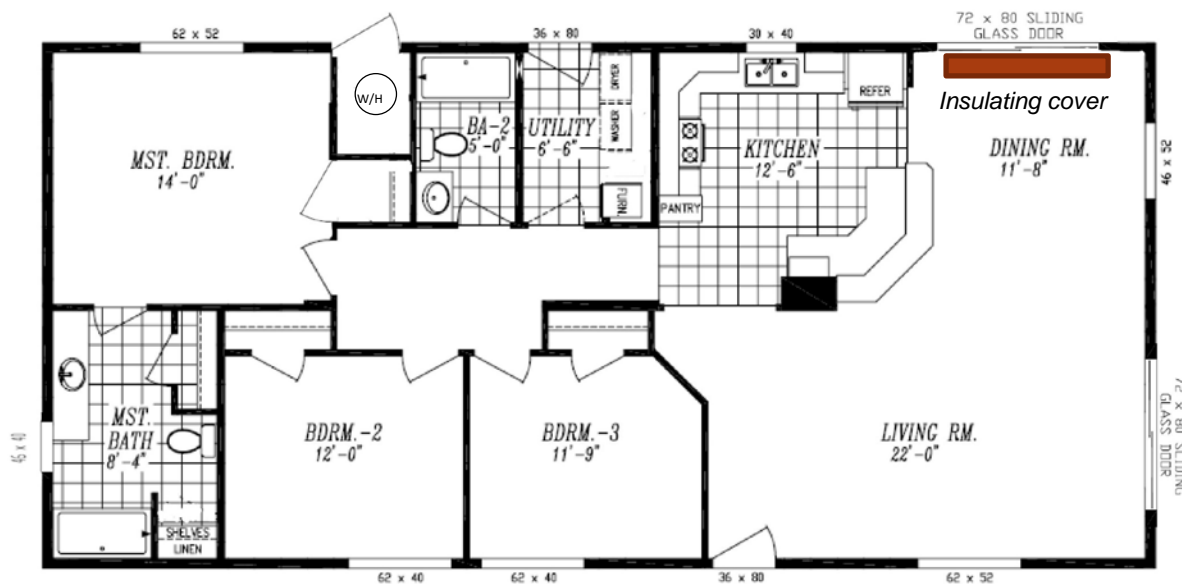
Floor Plan of the Lab Homes as Constructed
